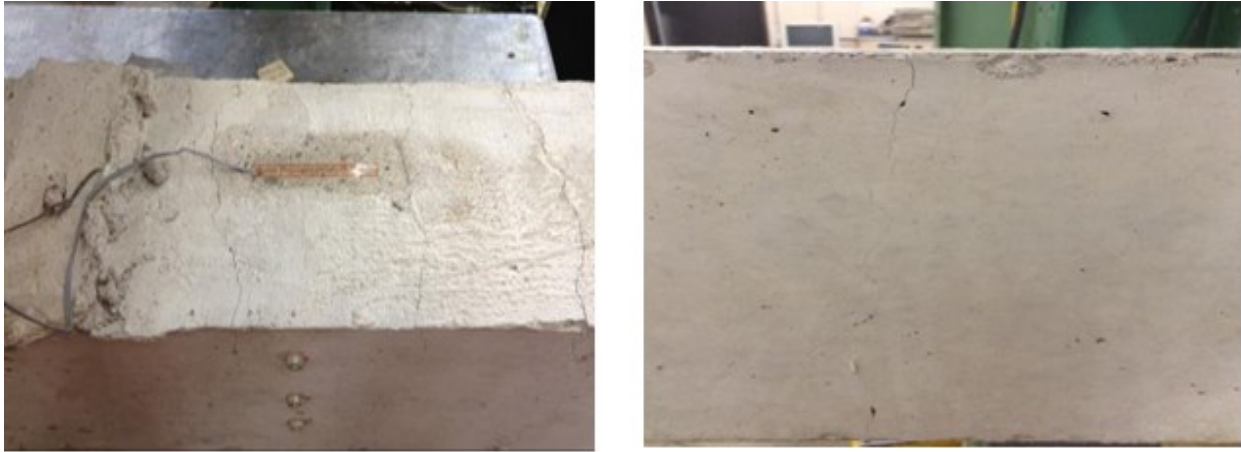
Cracks on the top fibre of the concrete sections during unloading.
